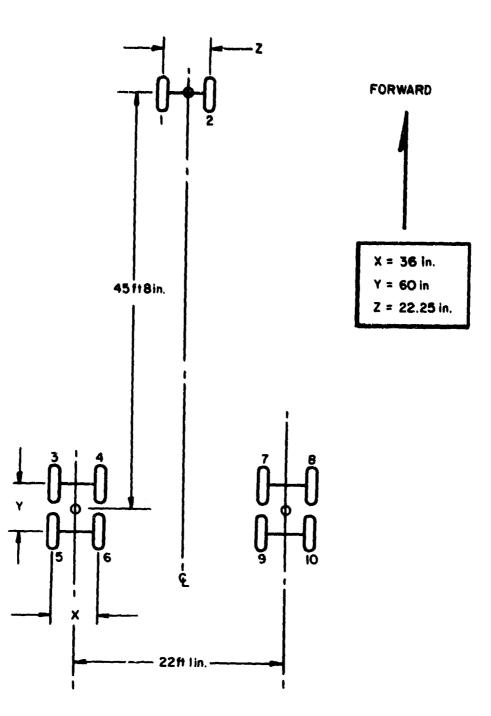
Landing Gear Configuration for KC-135 (Twin-Tandem Gear)
